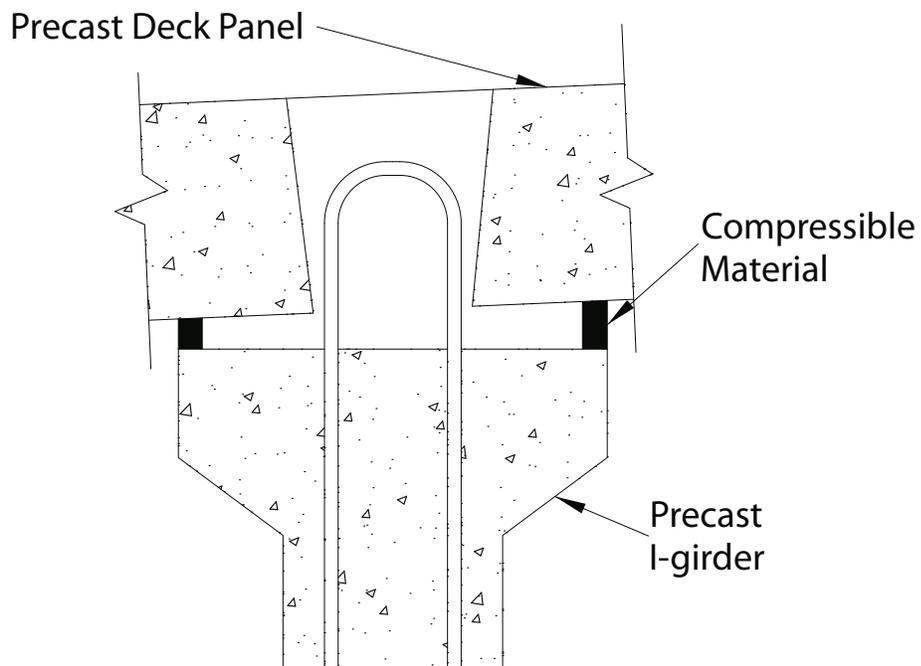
Leveling and haunch forming system similar for partial depth panels.
